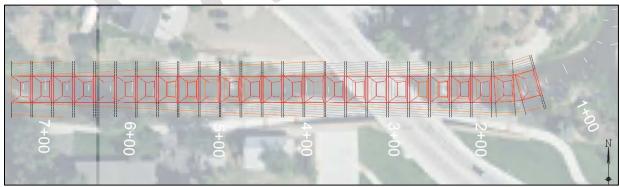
Proposed drop structure configuration plan (Alternative 10)
